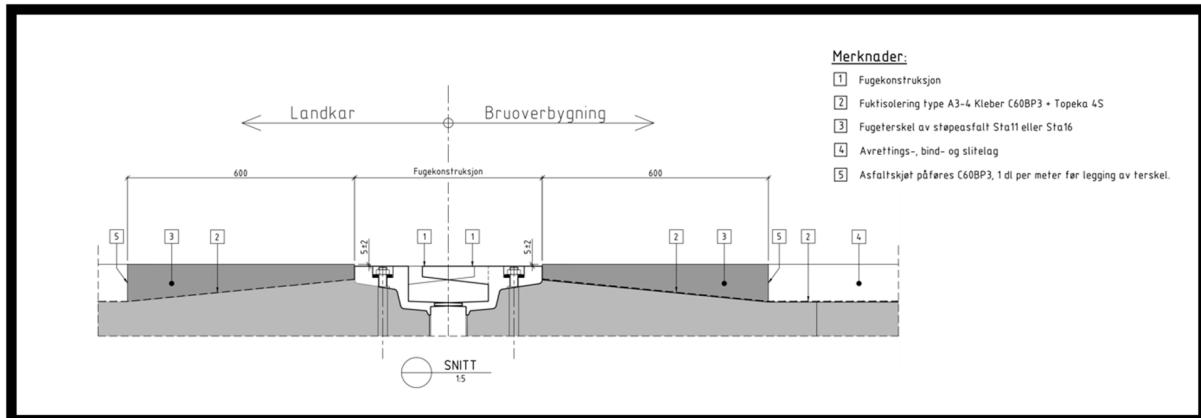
Membrane covering of a concrete joint shown in a drawing.
